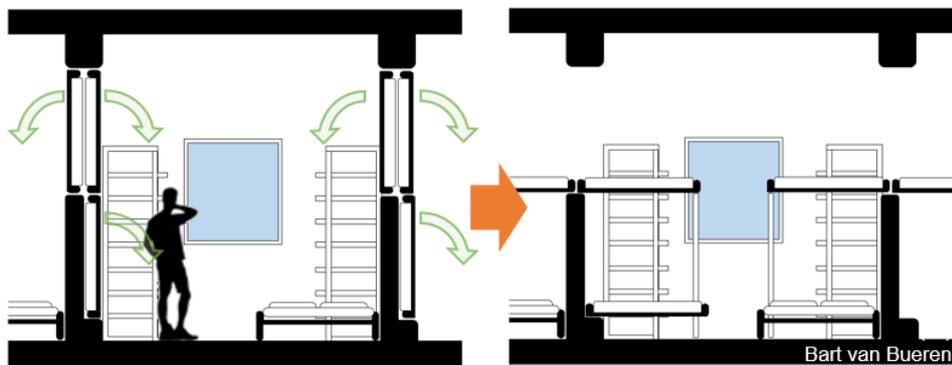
Concept of bunkbeds in the wall of a hotel room, Source: van Bueren (2019).
